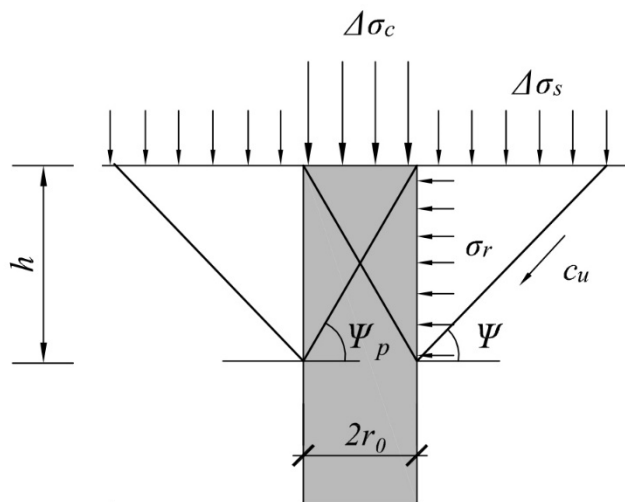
Bearing capacity failure of a singular column (Han, 2015)
